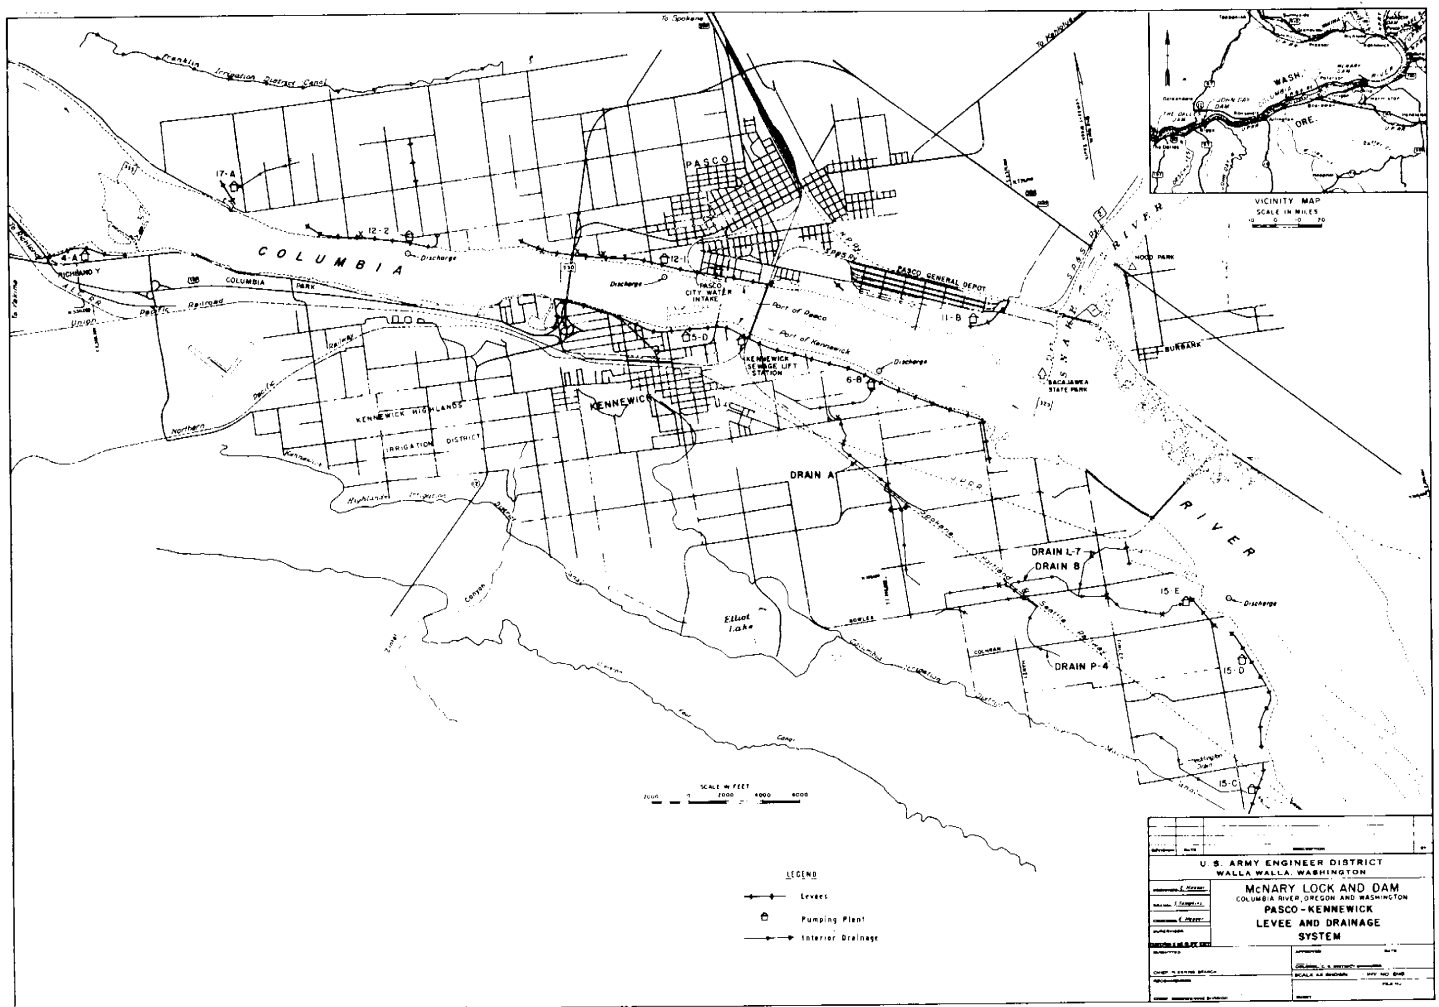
Pasco-Kennewick levee and drainage system in the Walla Walla U.S. Army Engineer District, Washington.
